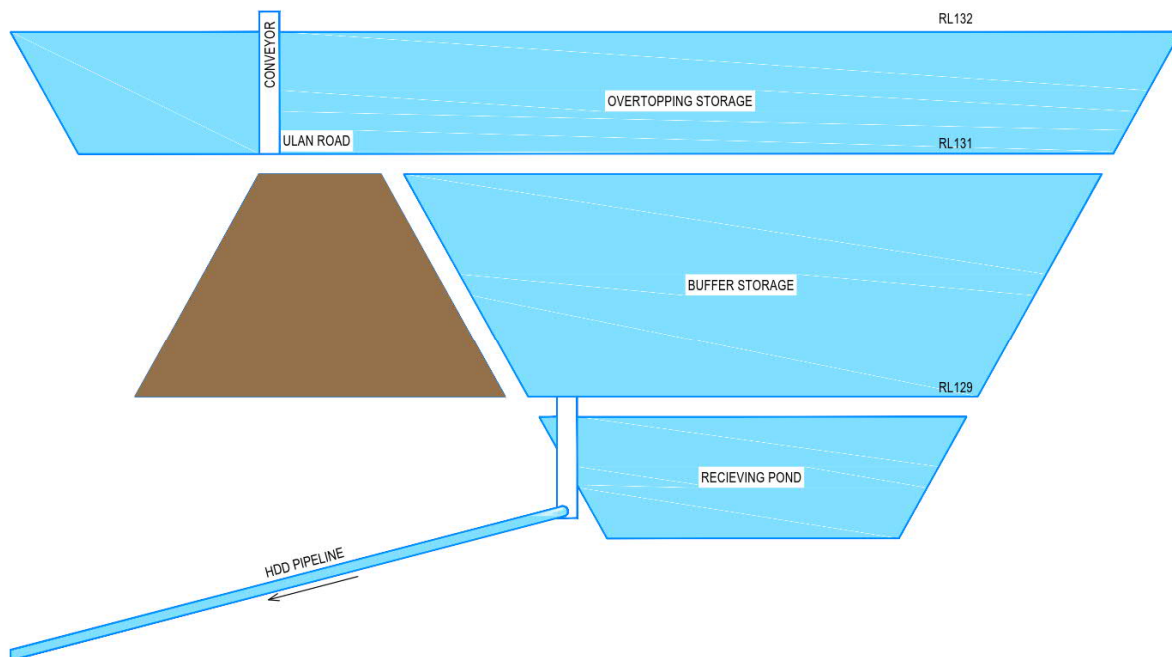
Receiving Pond Conceptual Arrangement in Cross Section
